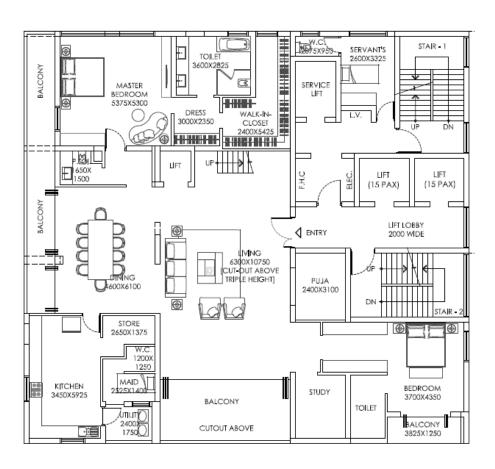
Architectural Plan of Typical Floor of G+24, G+30 and G+36 Storied Buildings
